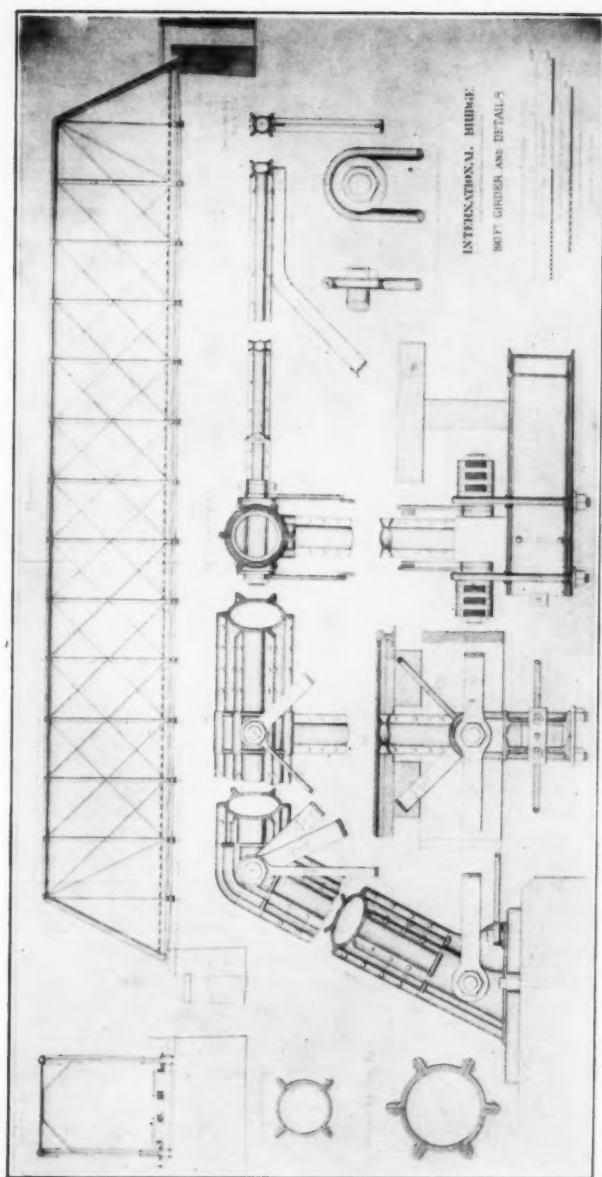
FIG. X. DETAILS OF PHOENIX COLUMNS, INTERNATIONAL BRIDGE.
